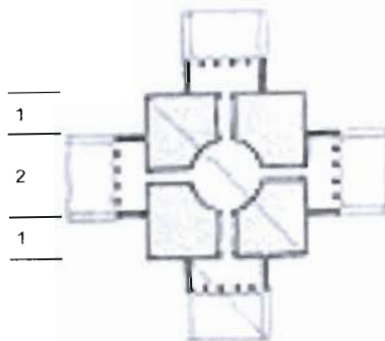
Plan of Villa Rotunda, showing the 1:2 proportioning ratio. (Source: www.lesterkorzilius.com)
